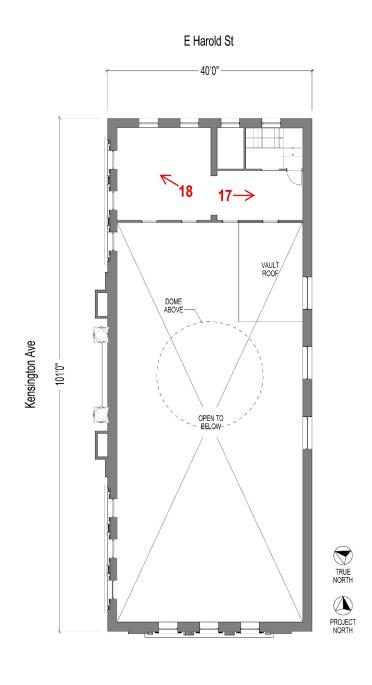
First-floor plan with photo key (plans by JKRP Architects, adapted for this document).
